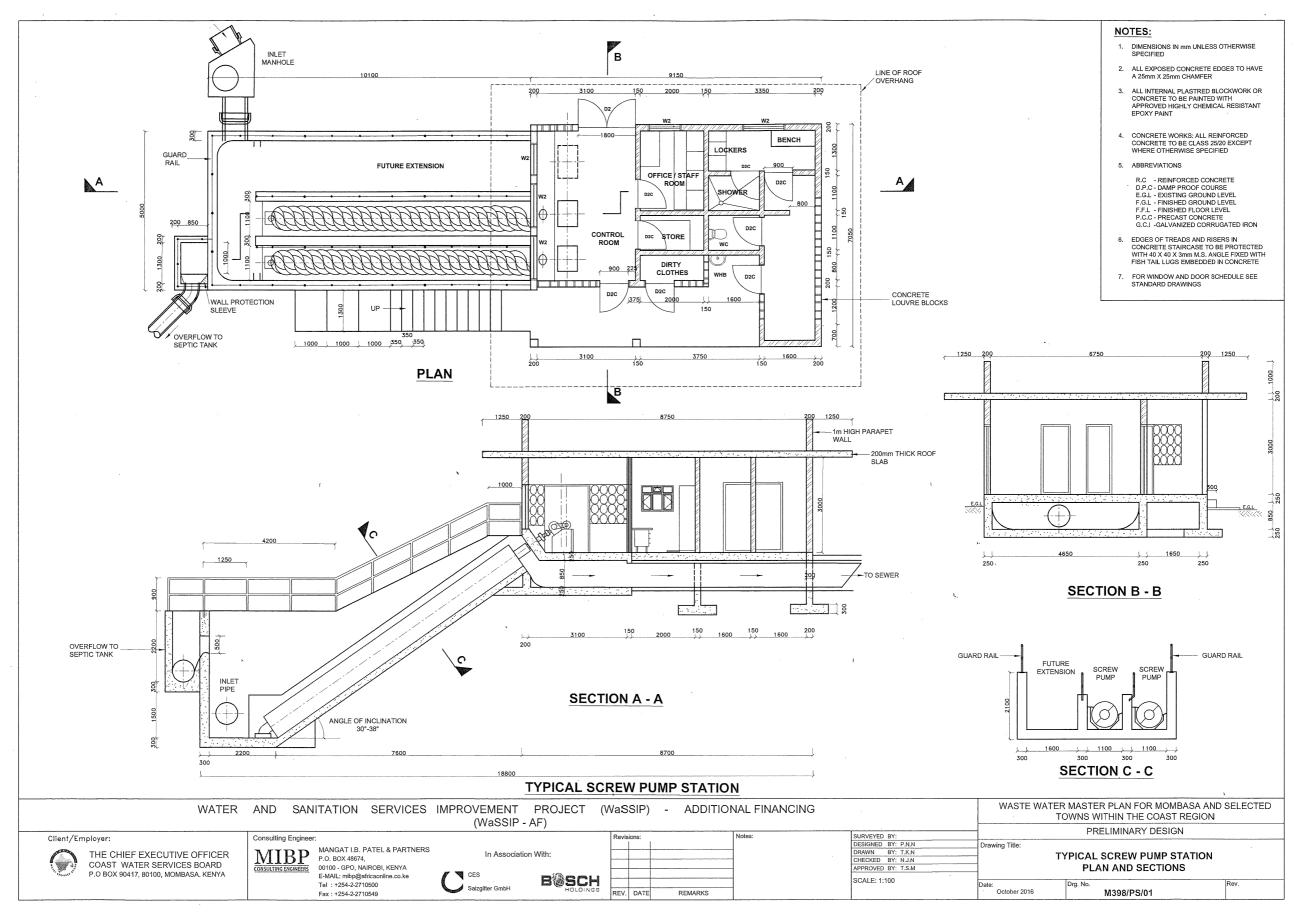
Layout Plan and Sections of a Screw Pumping Station
